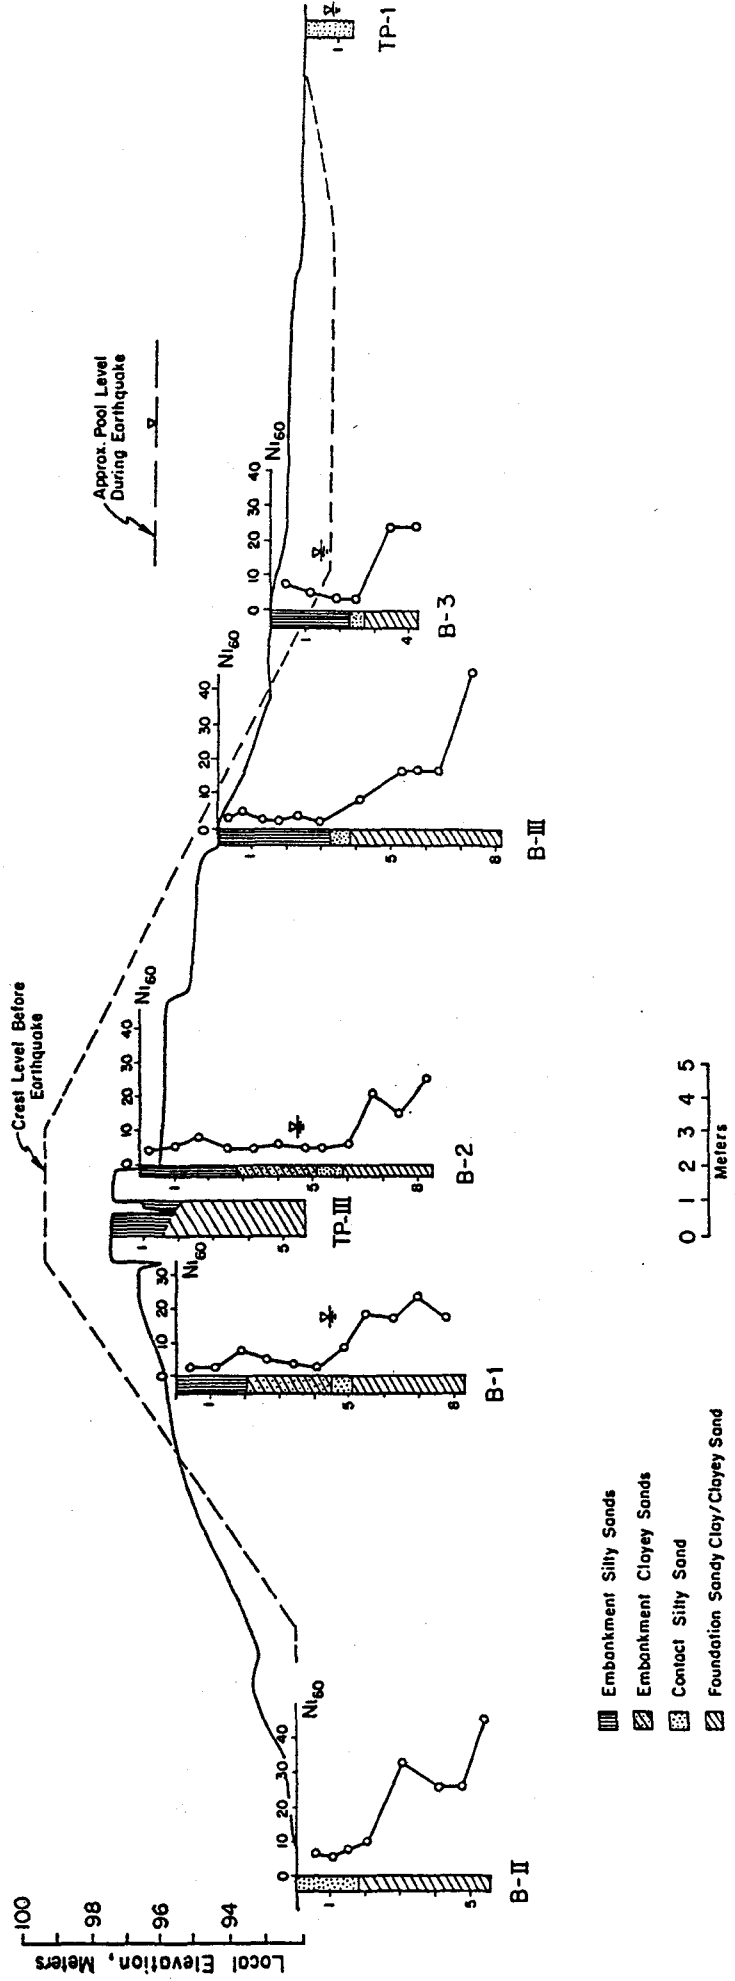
CROSS-SECTION THROUGH FAILURE ZONE OF LA MARQUESA EMBANKMENT
